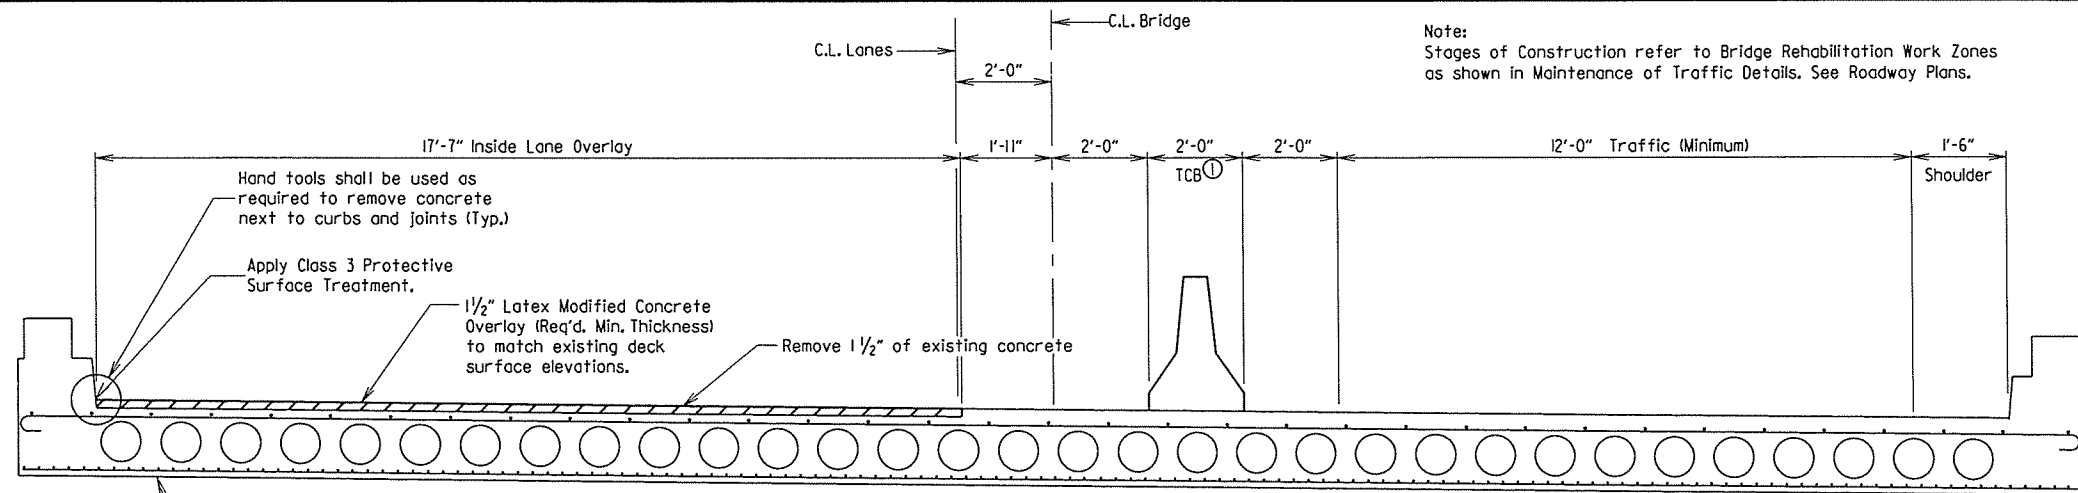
DETAILS OF LATEX MODIFIED CONCRETE OVERLAY
